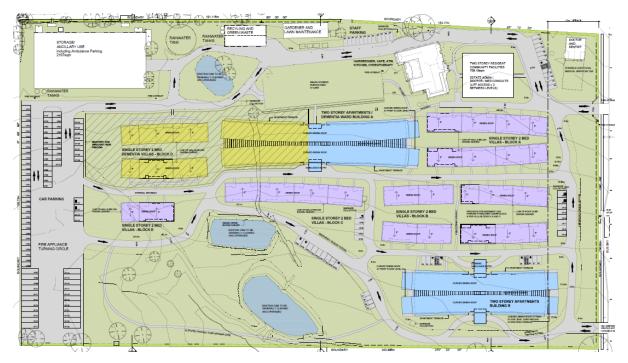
Indicative building plan (source: Phil O'Donnell Architects).
